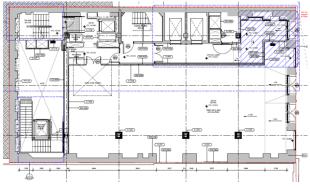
Beneficial House—Floor Plan, George Street level—showing proposed new stair and lift. (Source: Make + Architectus A-285-11-04-0, 17 April 2019)
